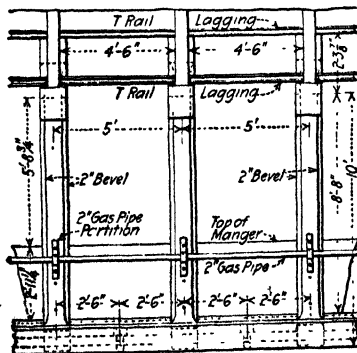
End elevation of arches for stable shown in Figs. 5 and 6.
